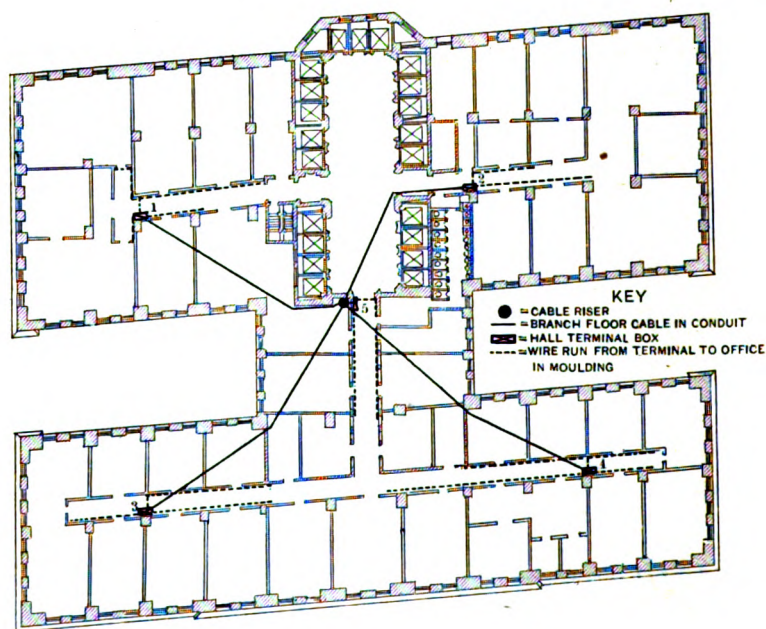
TERMINAL BUILDINGS—TYPICAL FLOOR PLAN IN CORTLANDT BUILDING.
